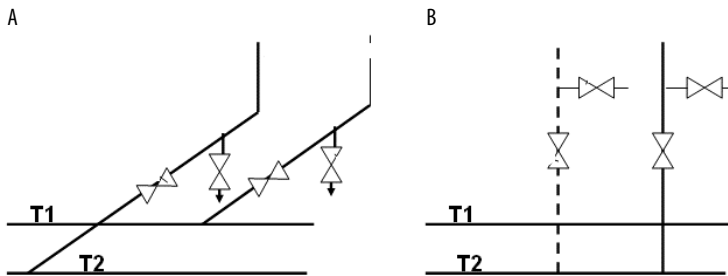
Heating system pipelines plan and scheme (Source: R. Bilinskienė's private archive)
